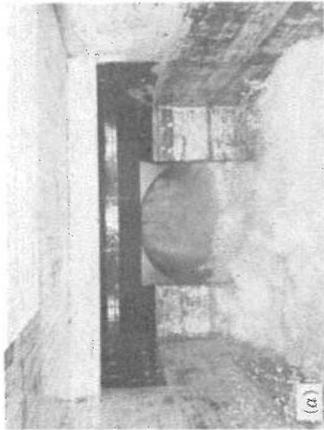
UNITED STATES OUTLET WORKS - FALCON DAM
